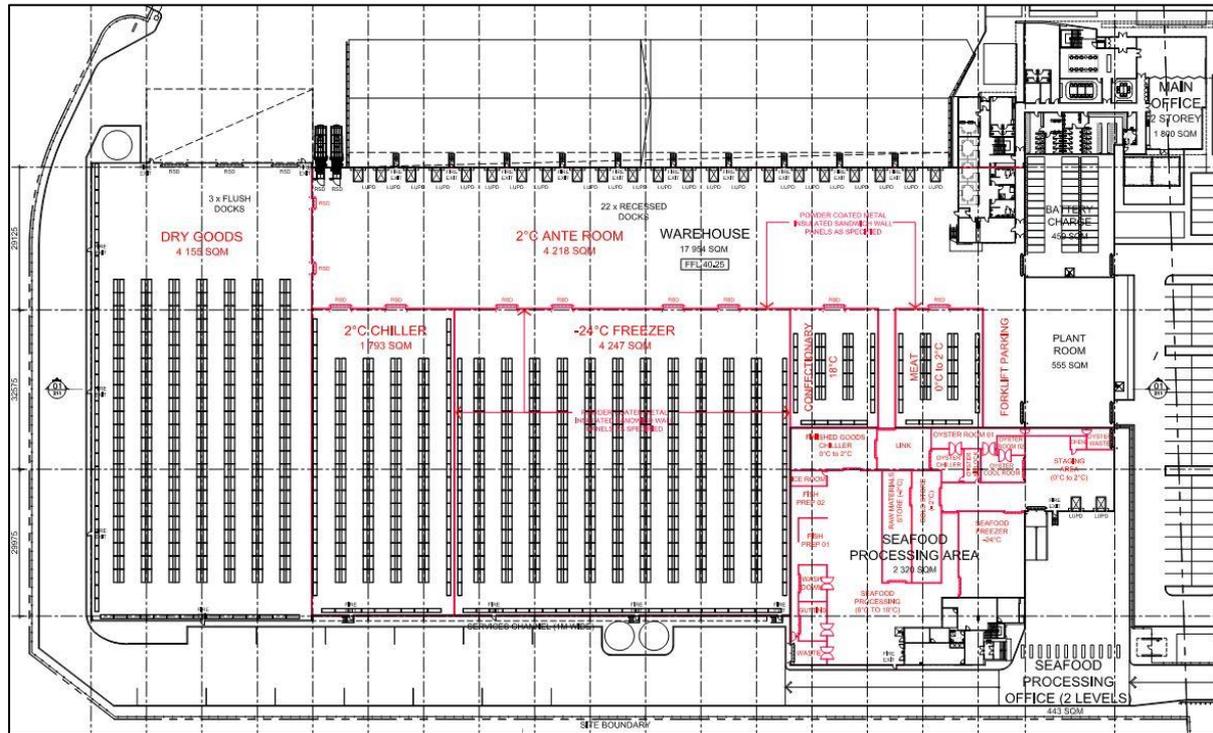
Proposed Layout Plan (Fraser's Property 2017)
